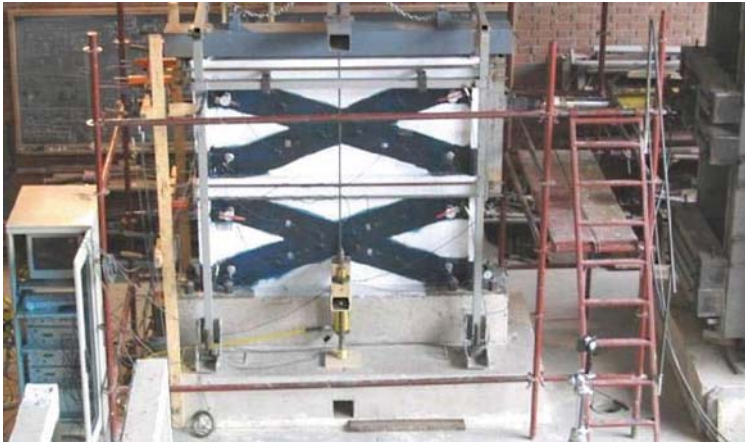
The test setup and instrumentation (See also Plate 25 in Color Plate Section on page 470)
